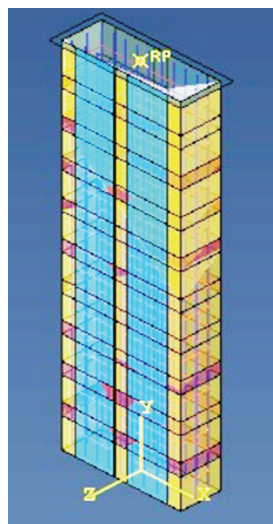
Typical Model of RCC Wall with Band Prestressing
